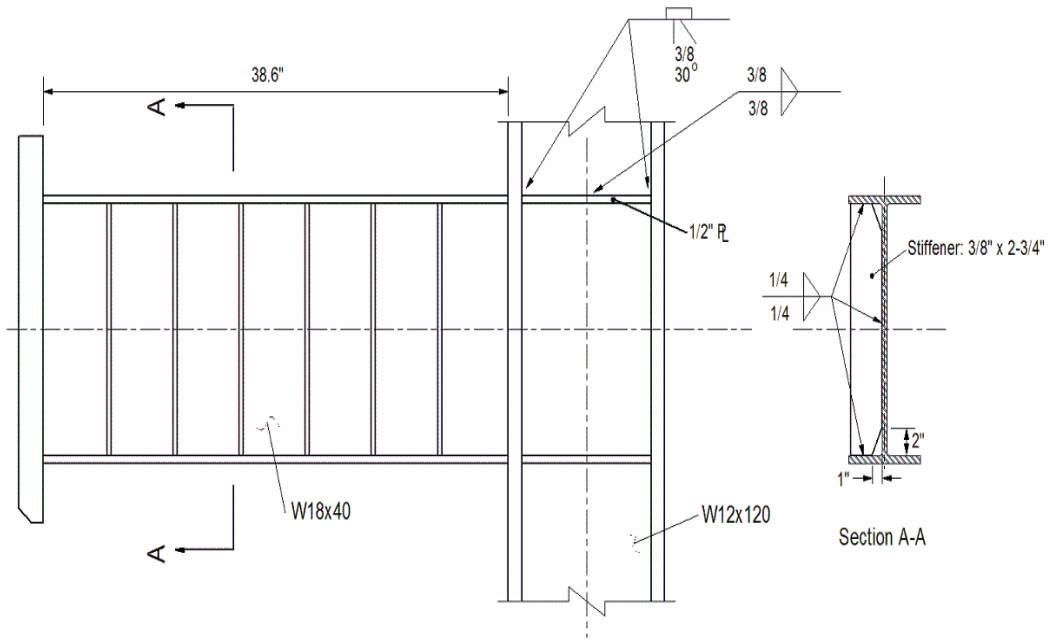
Specimens AISC 1 to 3 – Overall Layout
